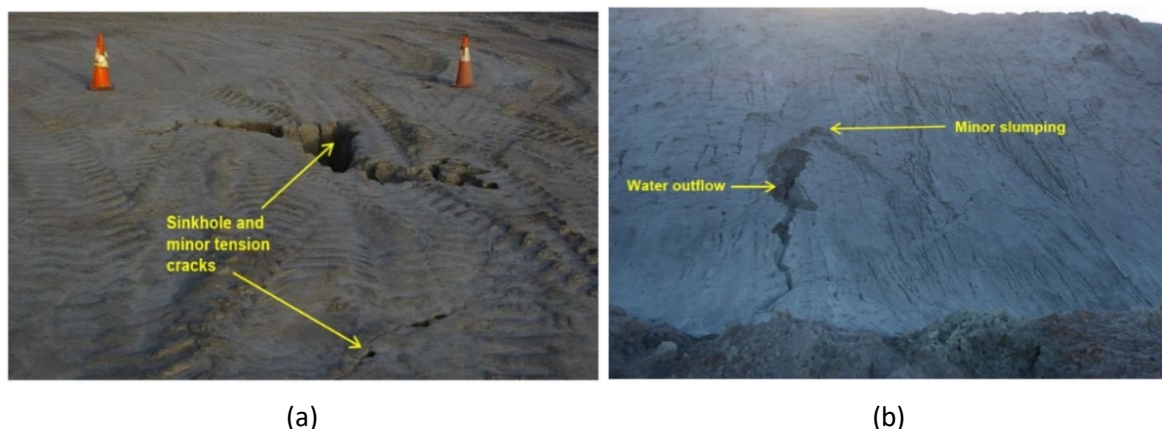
Effects of surface water ponding and infiltration. (a) Sinkholes developing due to infiltration through surface cracks; (b) Piping hole opening at outer face of dry stack embankment
